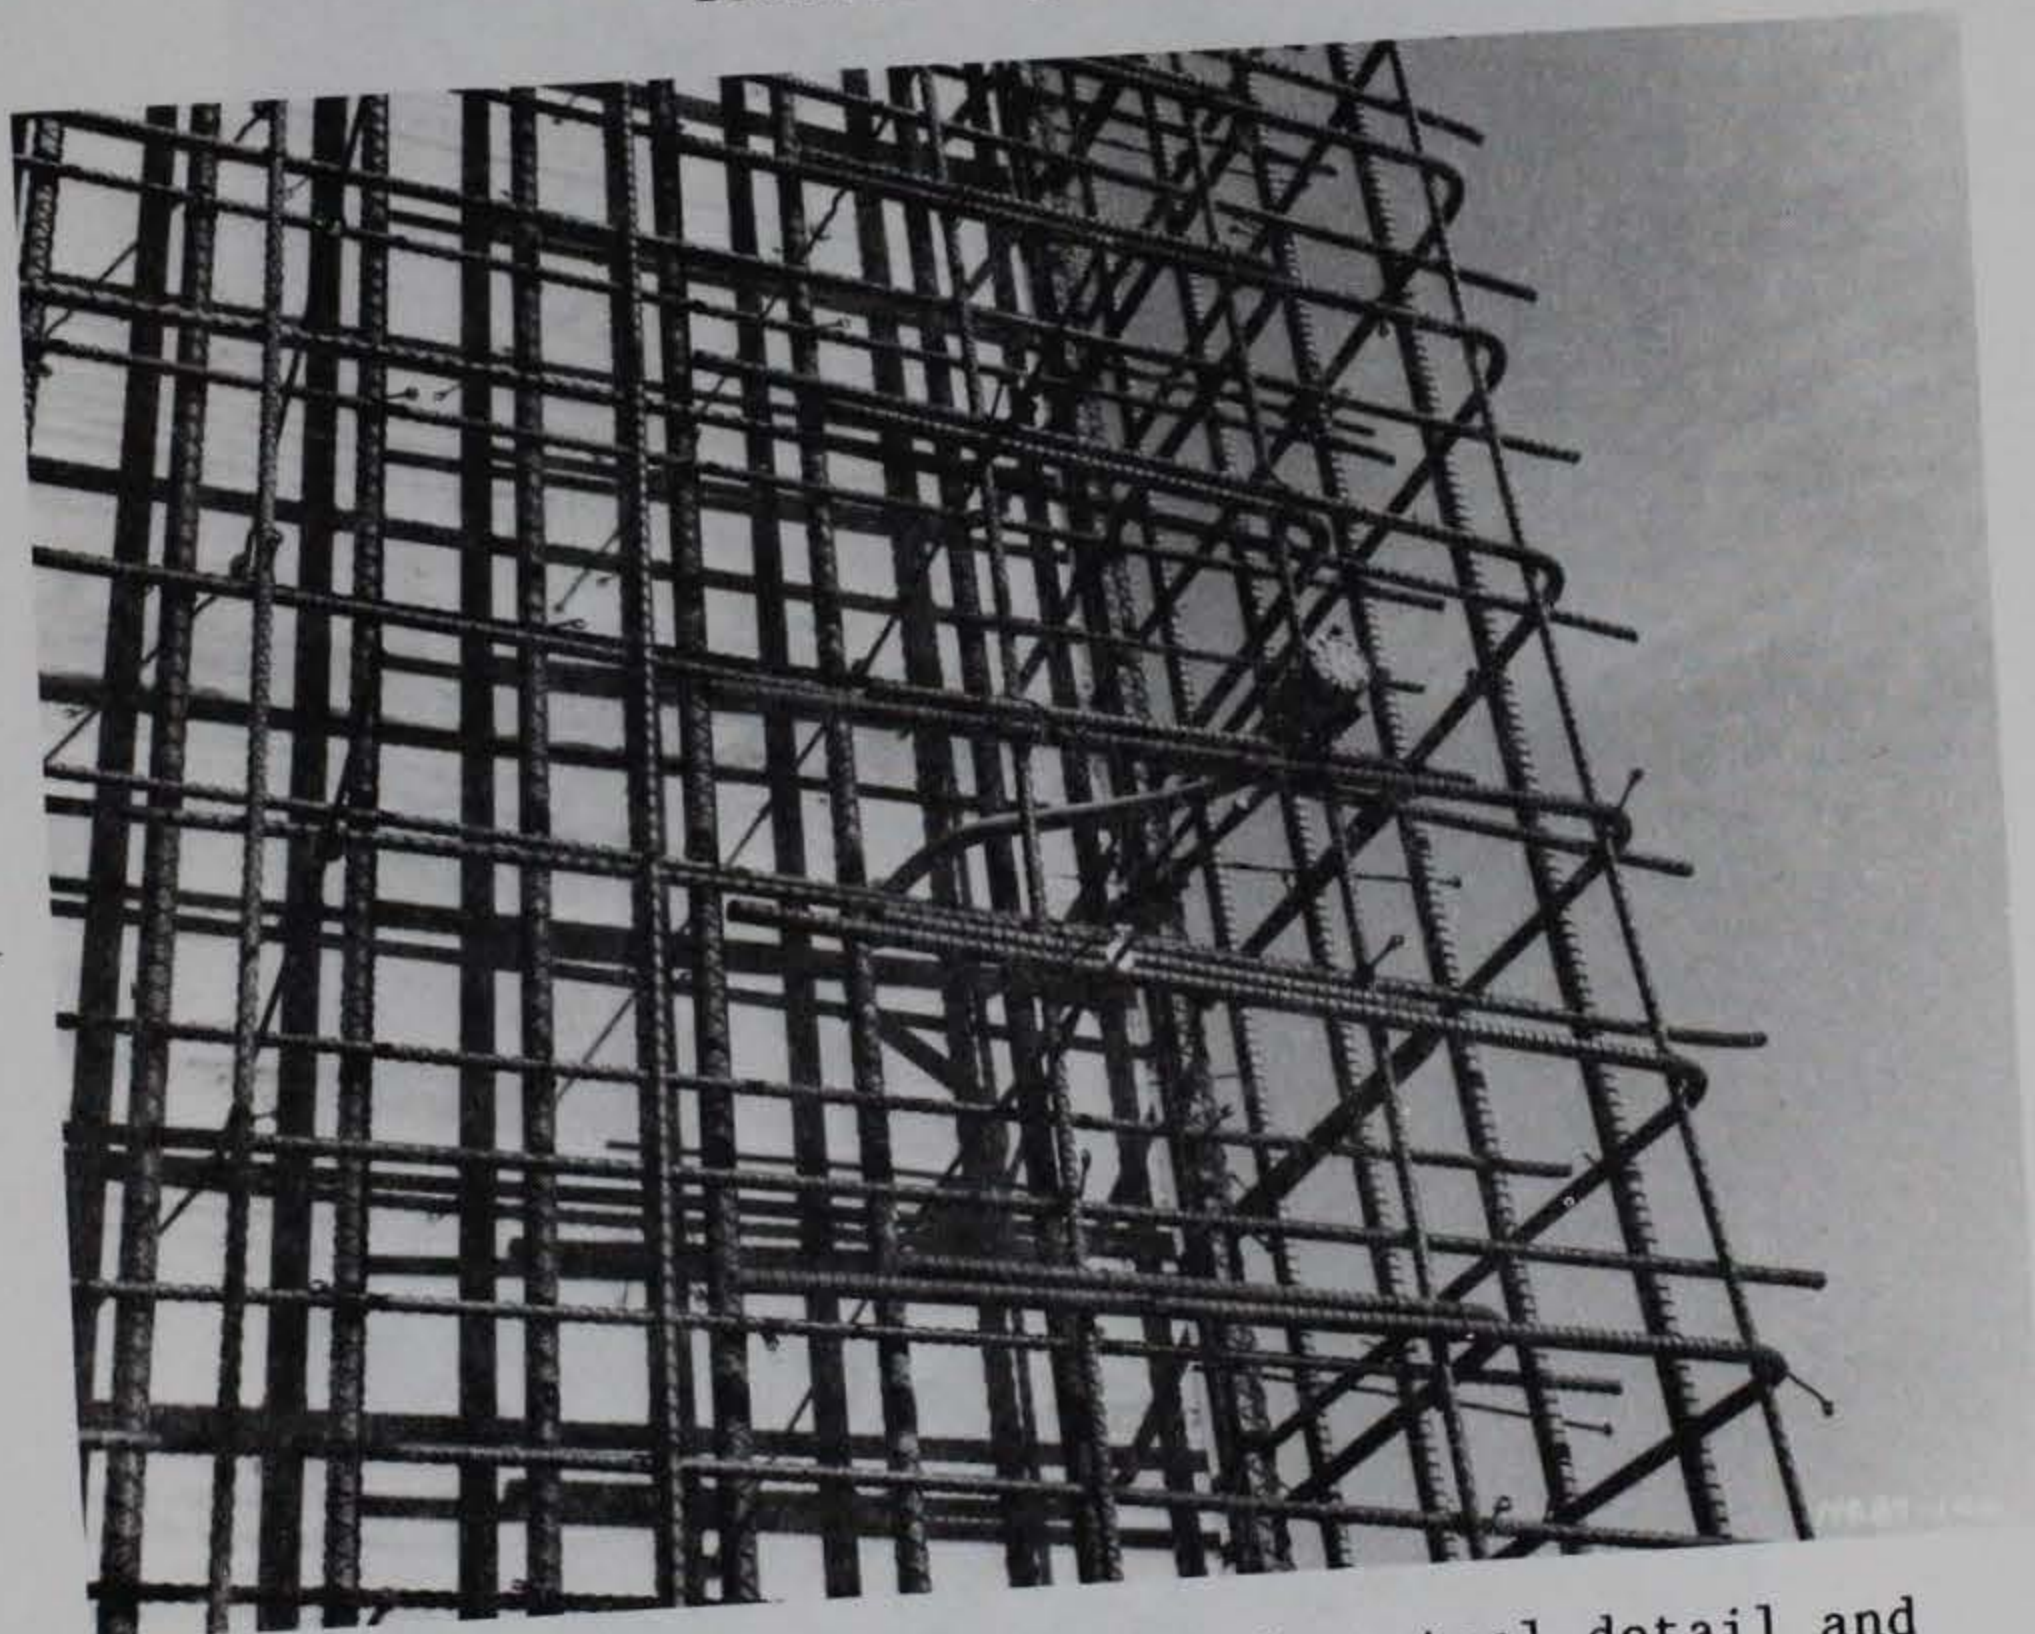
Corner reinforcing steel detail and interface pressure gage mount on acceptor bay wall.
